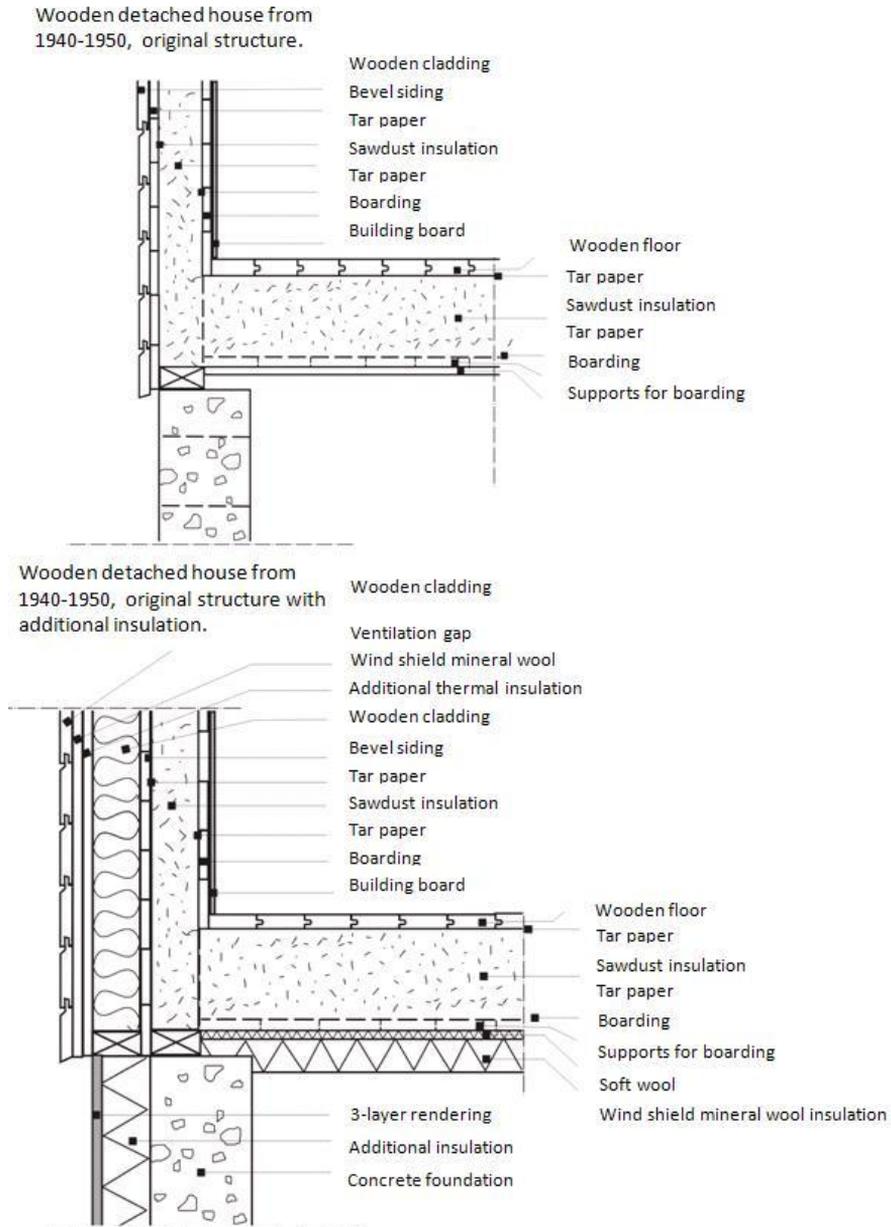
Base floor of detached wooden houses of 1940's–1950's, original structure and structure with additional thermal insulation.
